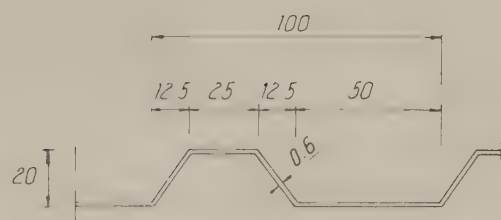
Dimensions of steel sheeting used for test beams K3 and K4.
